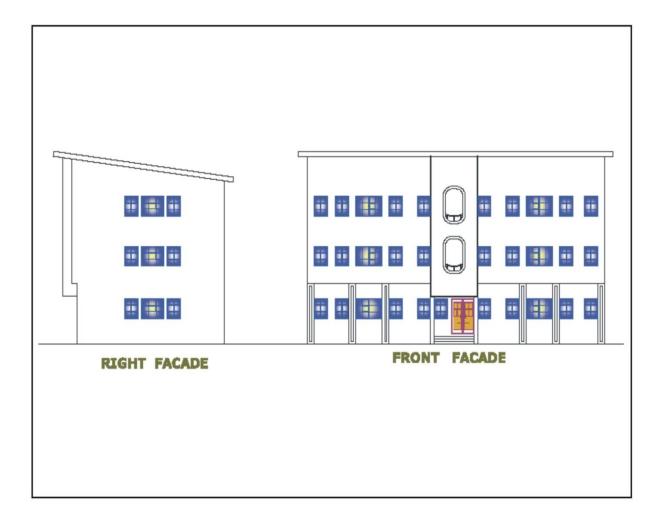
Prototype Botanical Garden Structure Office Building Front and Right Elevation Plans.
